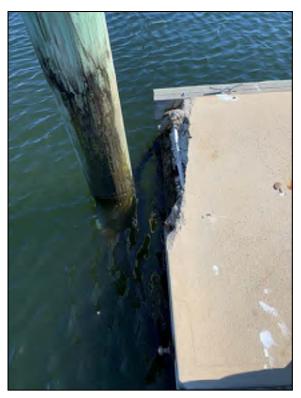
Concrete deterioration with exposed polystyrene float unit and steel reinforcement.
